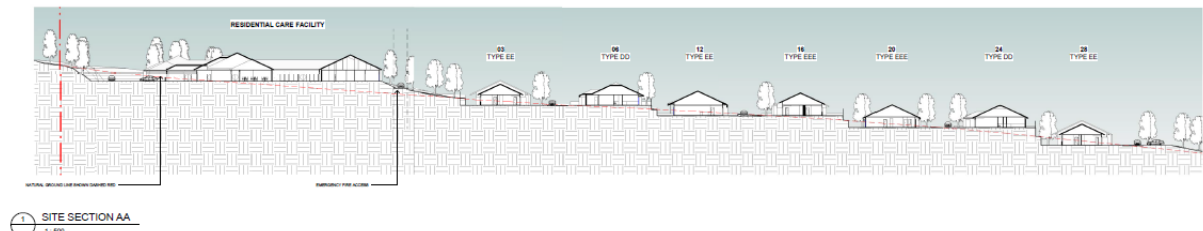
Site section AA from RCF (left) down to duplex/triplex units (right)
